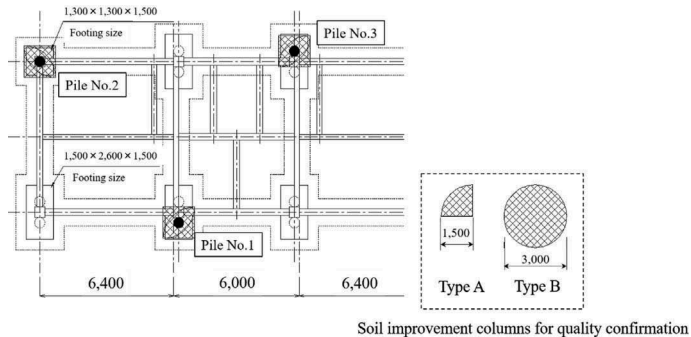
Plan view of the foundation, piles No. 1-3 and soil improvement columns (including types A and B for quality confirmation)
